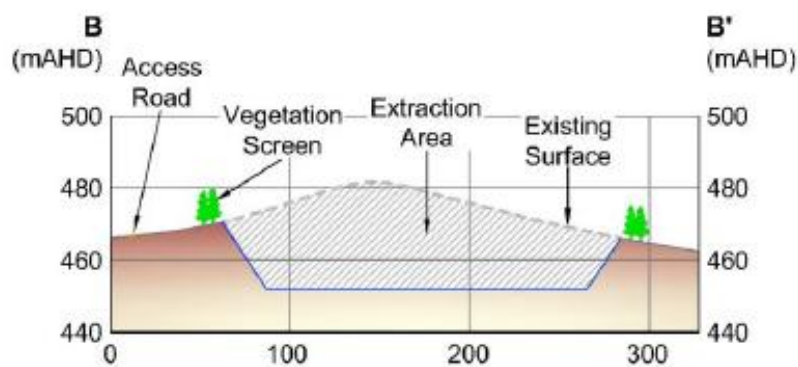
Proposed Extraction Section – Northeast to Southwest (extract from applicant's EIS)
